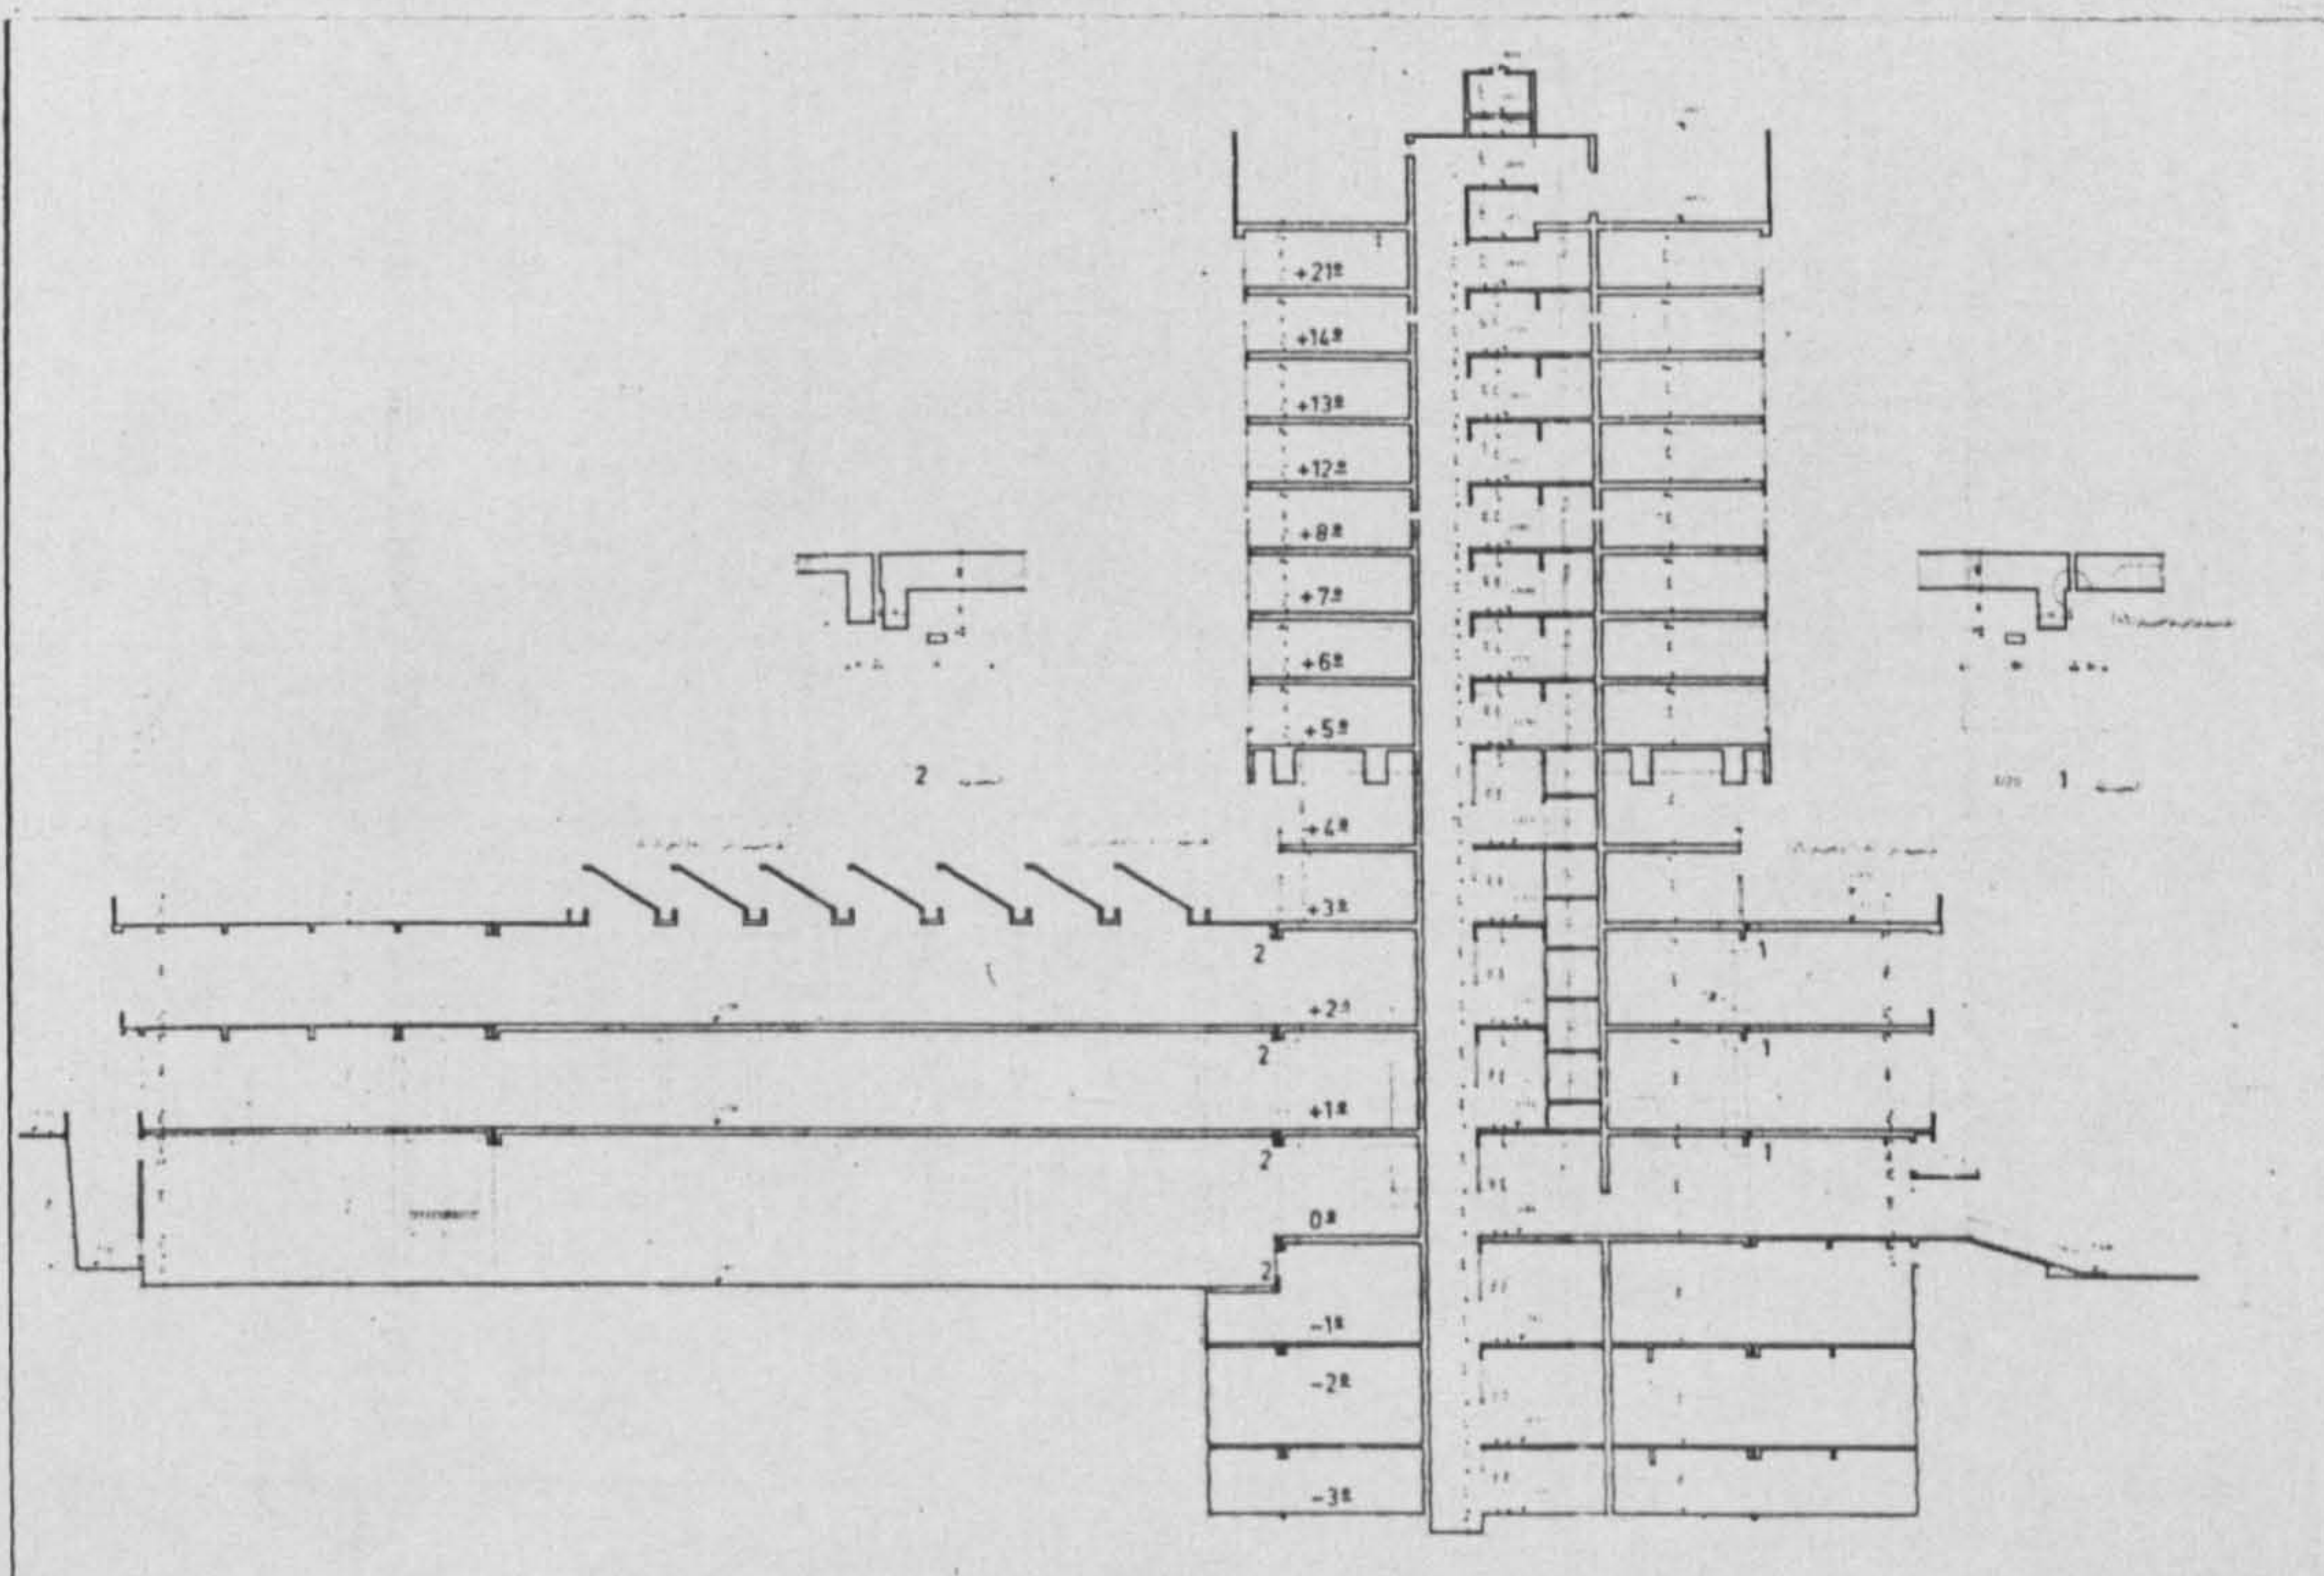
Long section (typical final scheme drawings scale 1/100).
